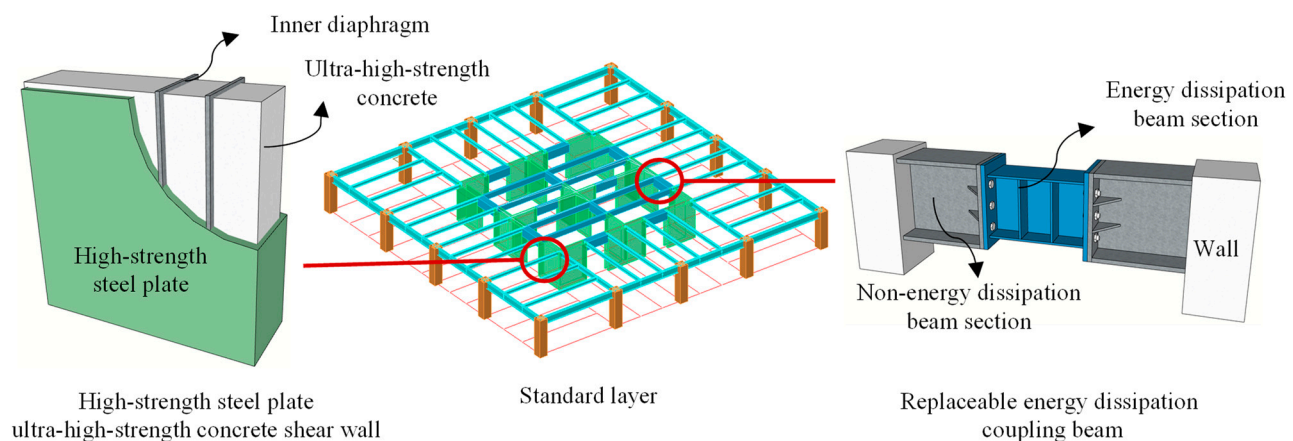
Diagram of the high-strength steel plate ultra-high-strength concrete shear wall and the replaceable energy dissipation coupling beam.
